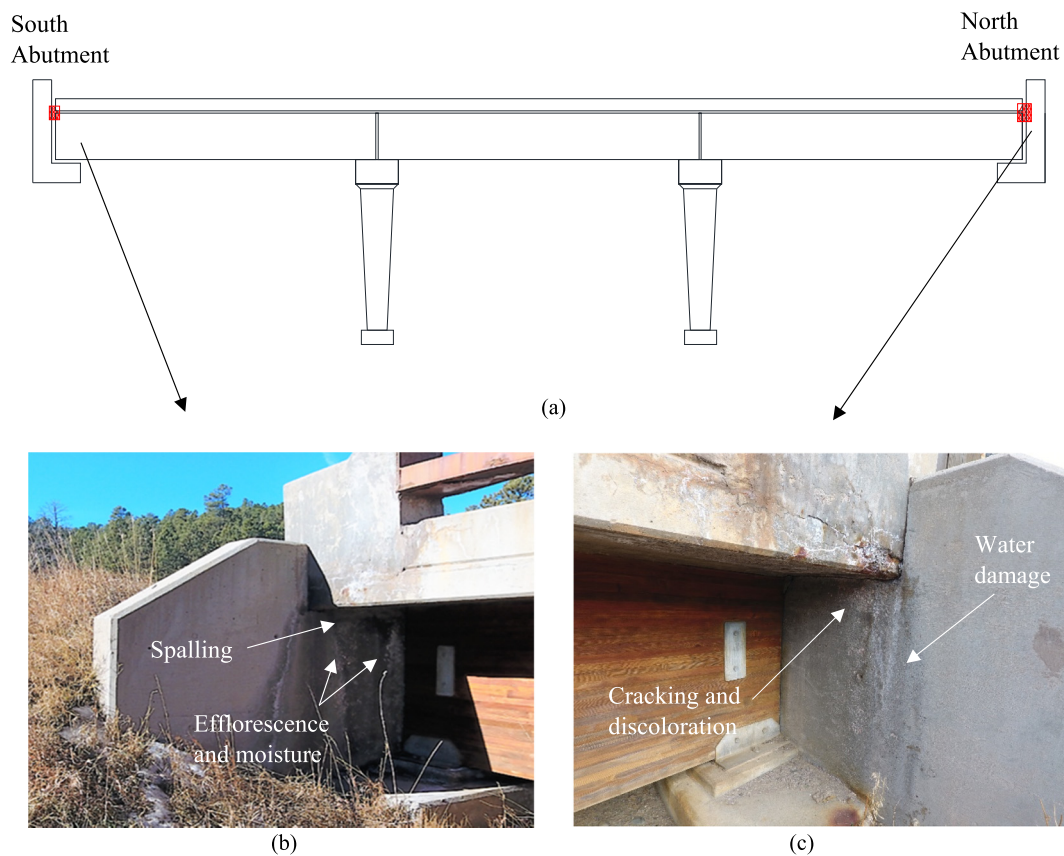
Sample damage on Abutment: (a) schematic of damage location on abutment; (b) damage on South Abutment near Girder 4 (taken by Luis Duque using drone); and (c) damage on North Abutment near Girder 4 (taken by Junwon Seo using drone).
